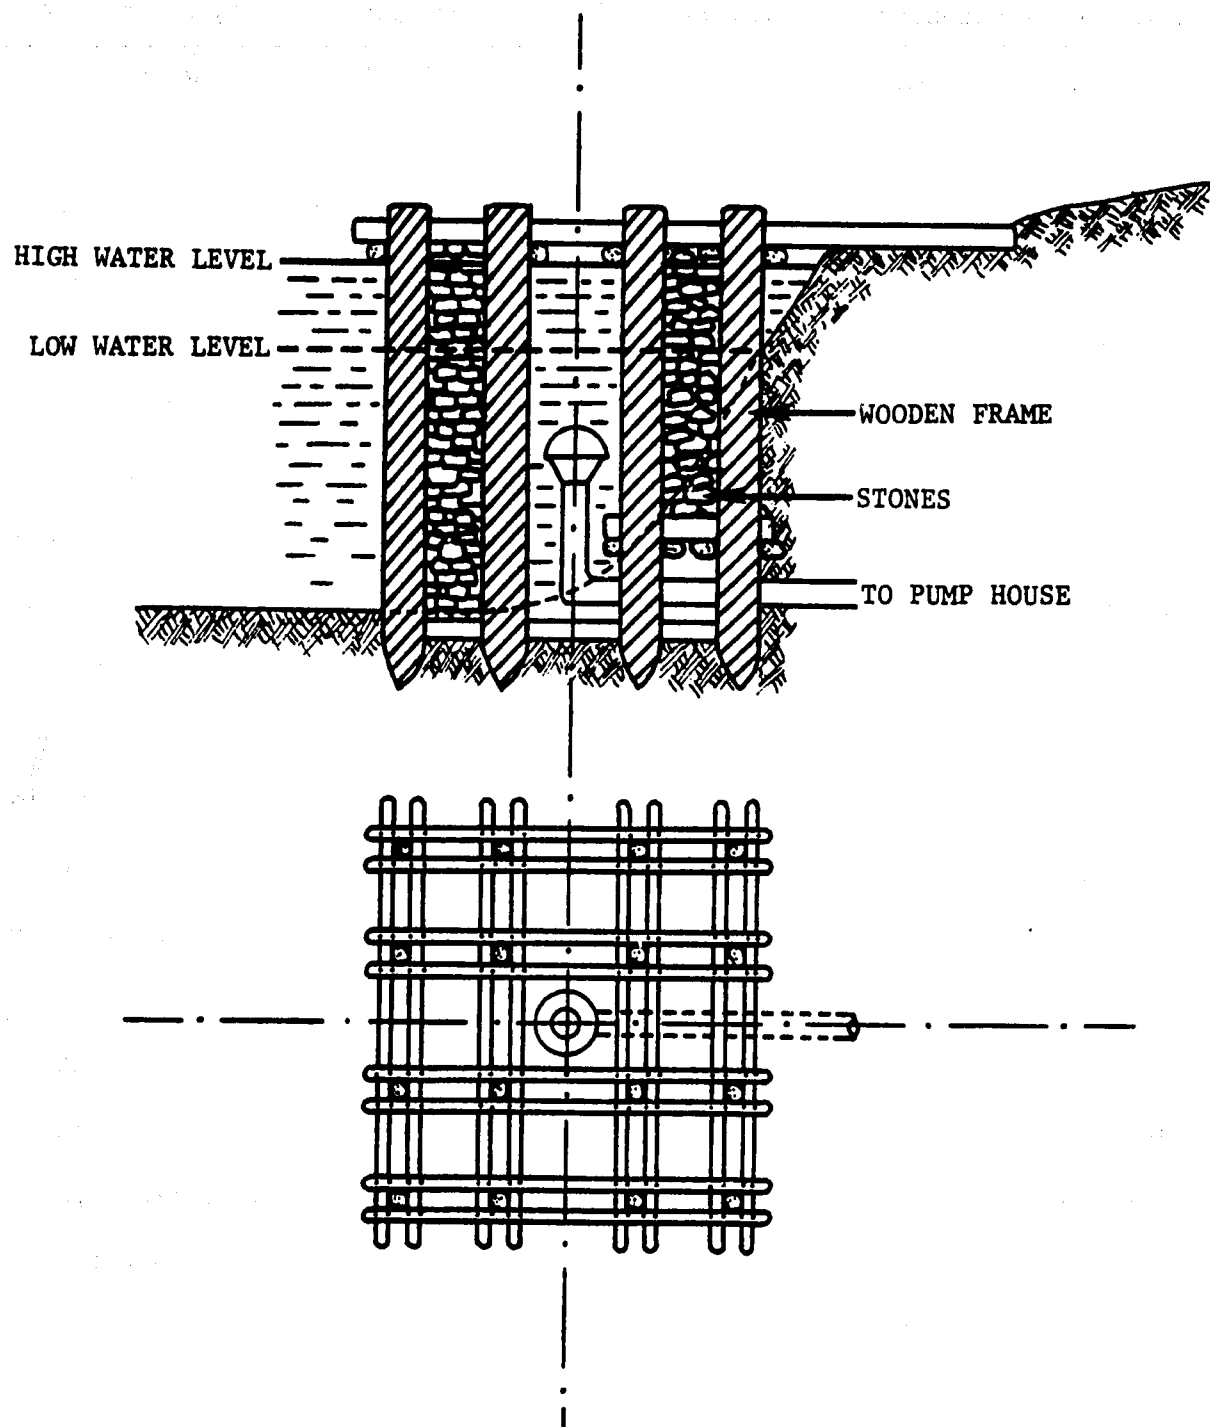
Protected river intake (schematic, not to scale).
